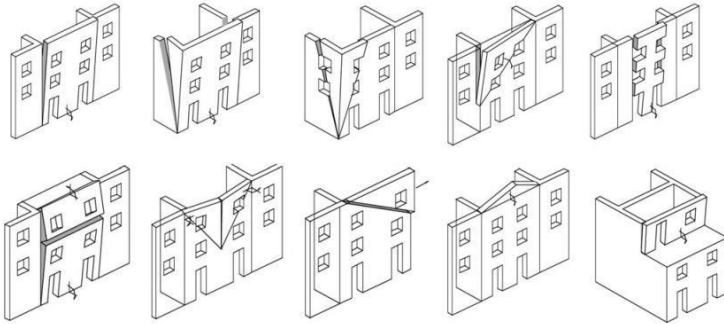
Kinematic out-of-plane failure mechanisms of unreinforced masonry buildings.
